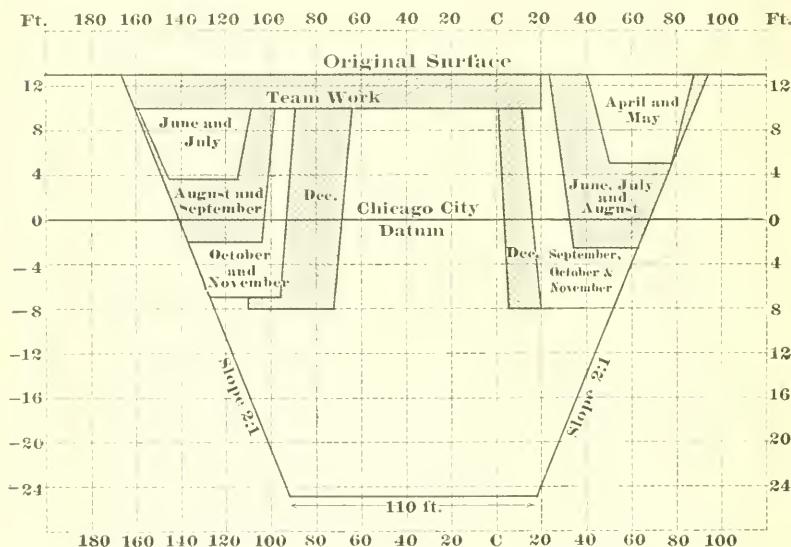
TYPICAL CROSS-SECTION SHOWING PROGRESS OF WORK TO DECEMBER 31, 1894. SECTION L.
